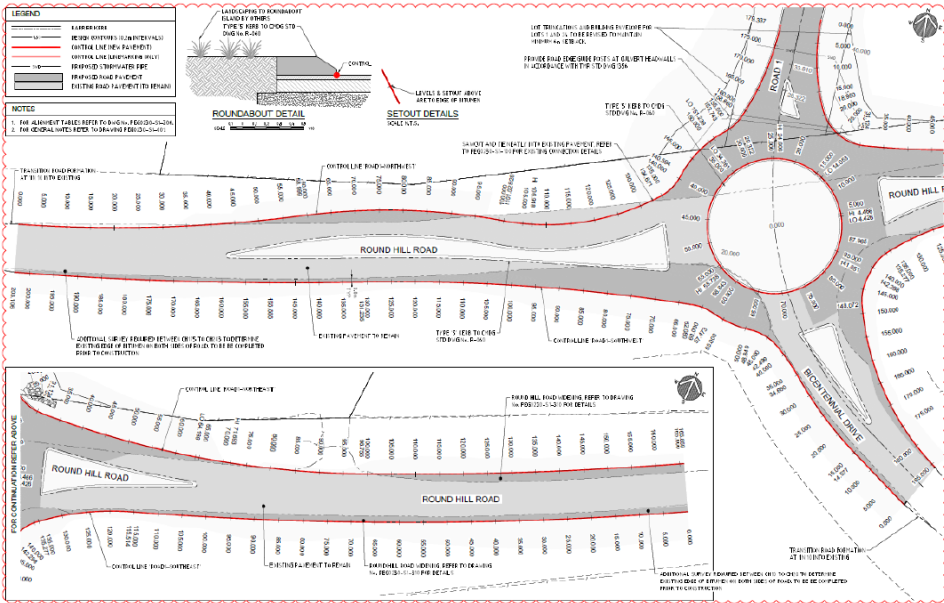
Proposed Roundabout Design for 2773 Round Hill Road
